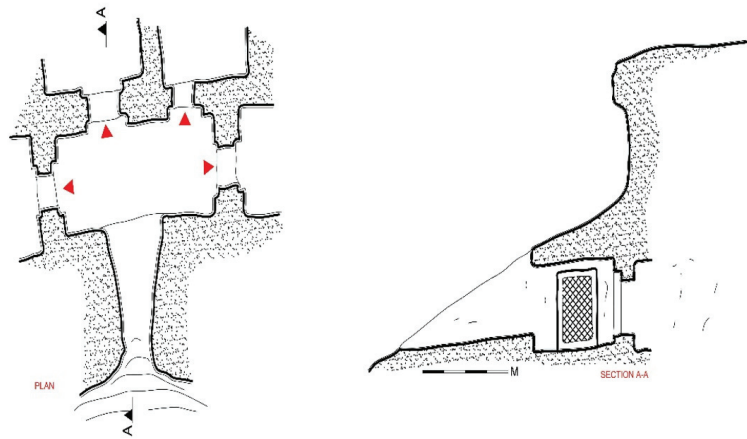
The third stage of excavation of doorways (Dargah) in cross-section and plan view.
